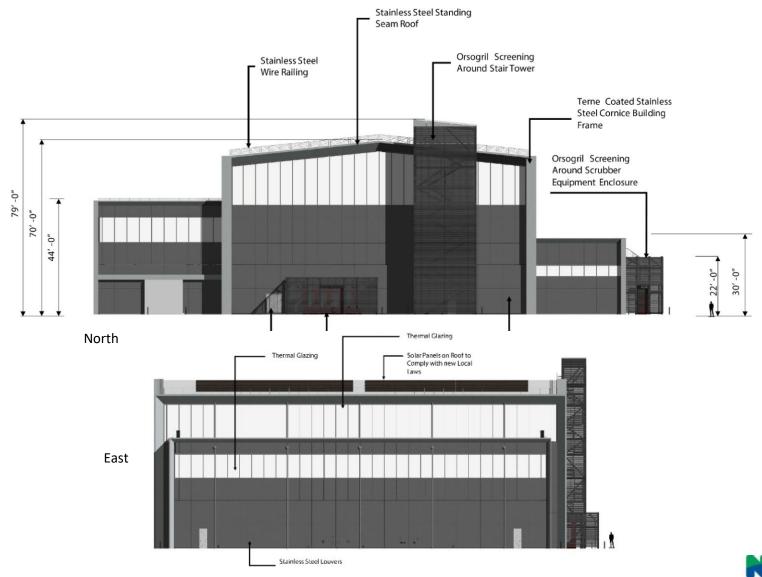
KEC Screen Chamber – North and East Elevations
